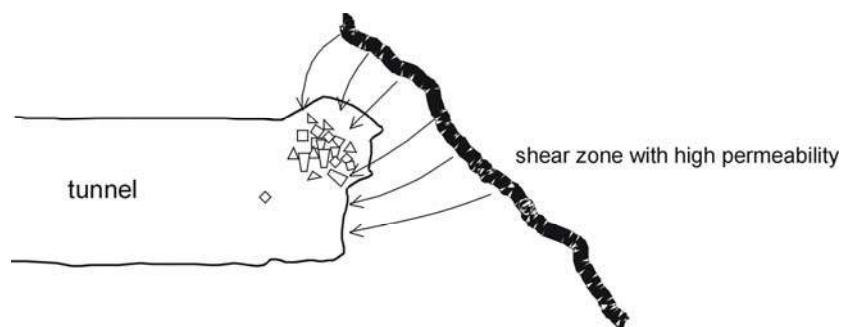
Water flow and pressures from localized high permeability zones may break through in tunnel before tunnel reaches the zone
